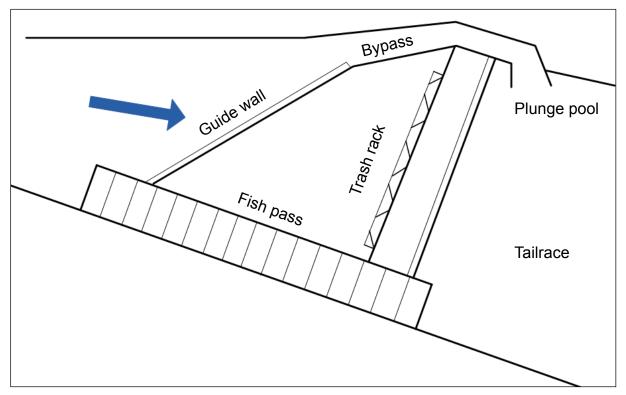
Guide wall at Bellows Falls Power Station (adapted from Larinier & Travade, 2002; based on Odeh & Orvis, 1998)
